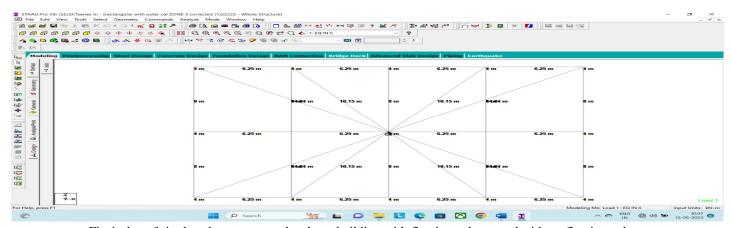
plan of single column rectangular shape building with floating column and without floating column
